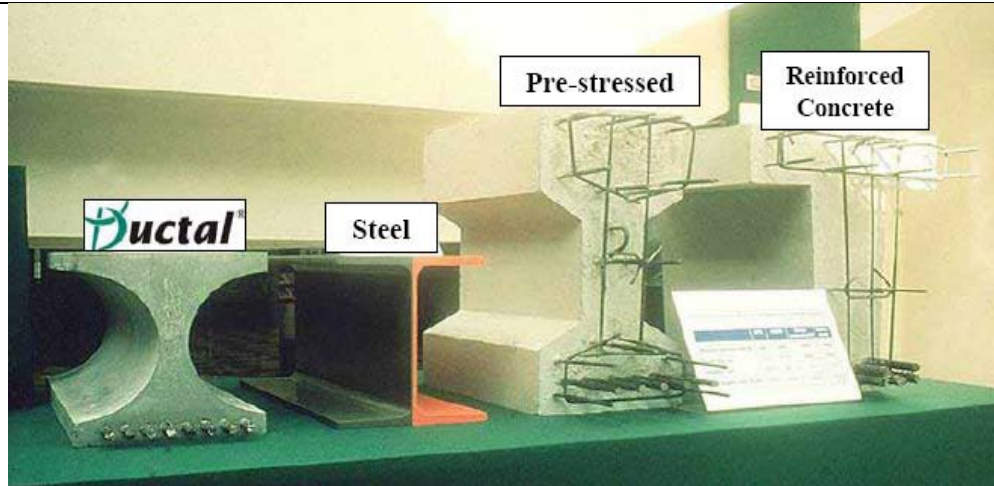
Ductal, steel, prestressed, and reinforced concrete beams with equal moment capacities
